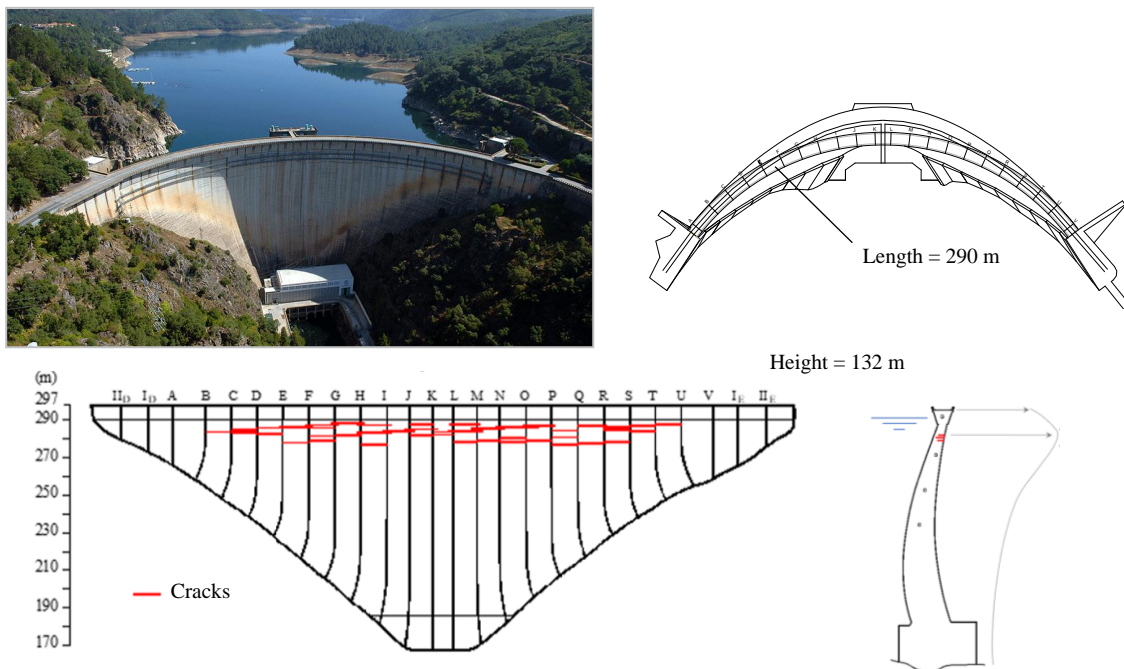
Cabril dam, Portugal. Aerial view and technical drawings.
